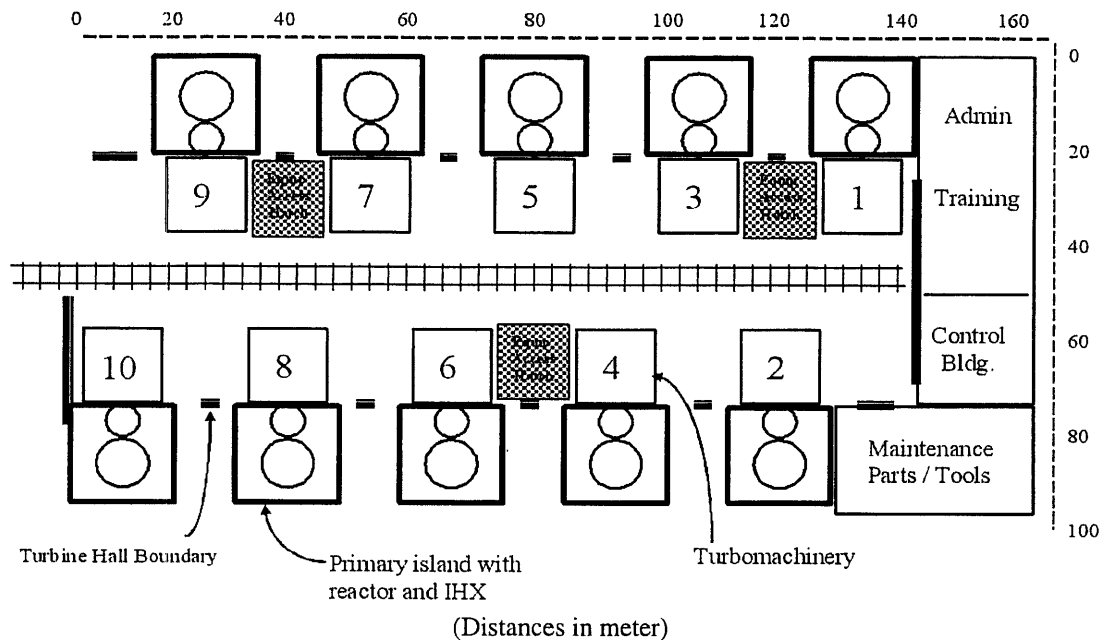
10-Unit MPBR Plant Layout (top view) [3-2]
